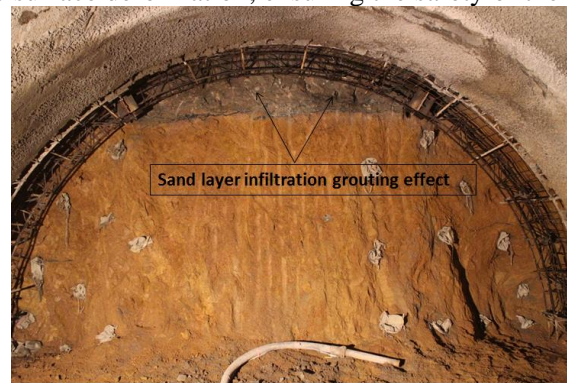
Quick-setting slurry infiltration grouting reinforcement
